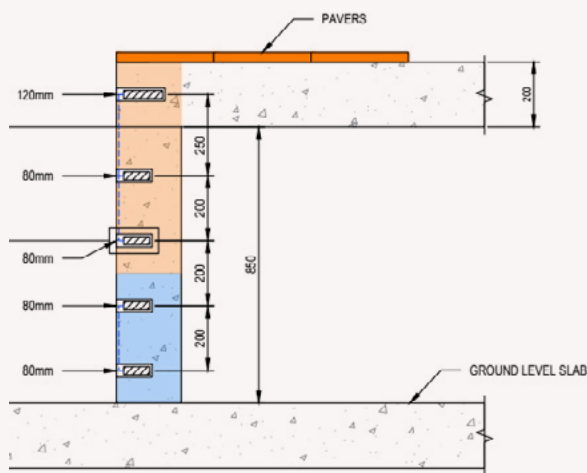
Sketch of typical pool wall cross-section. Orange and blue areas are separate CP zones. Short, discrete anodes are to be installed from within the pool.
